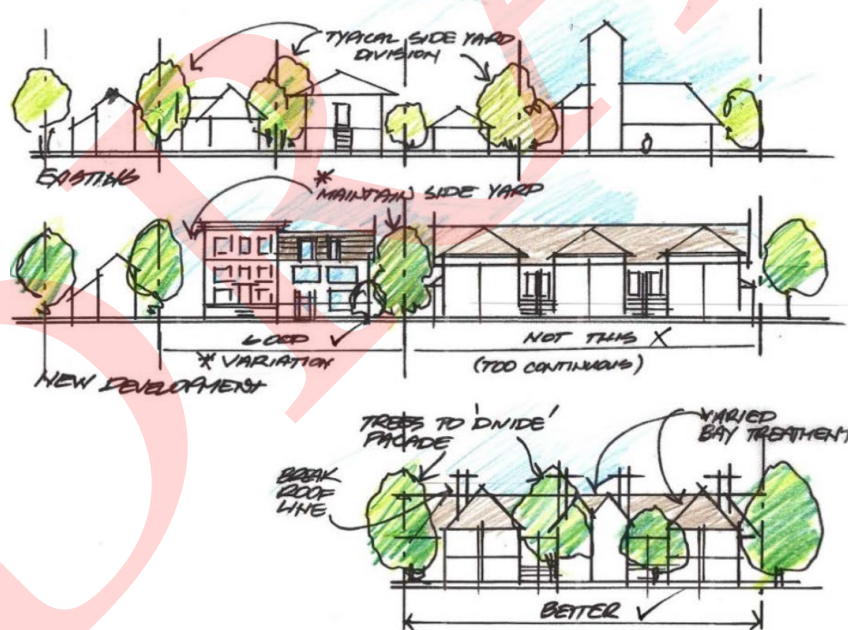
Examples of recommended streetscapes applicable to the Mountain View area.
